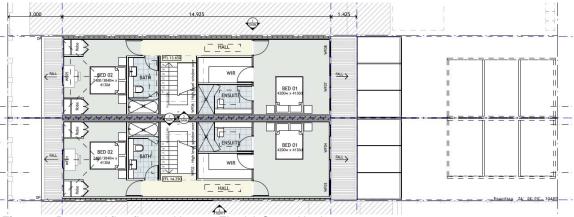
Proposed first floor at No. 223 Elswick Street North.
